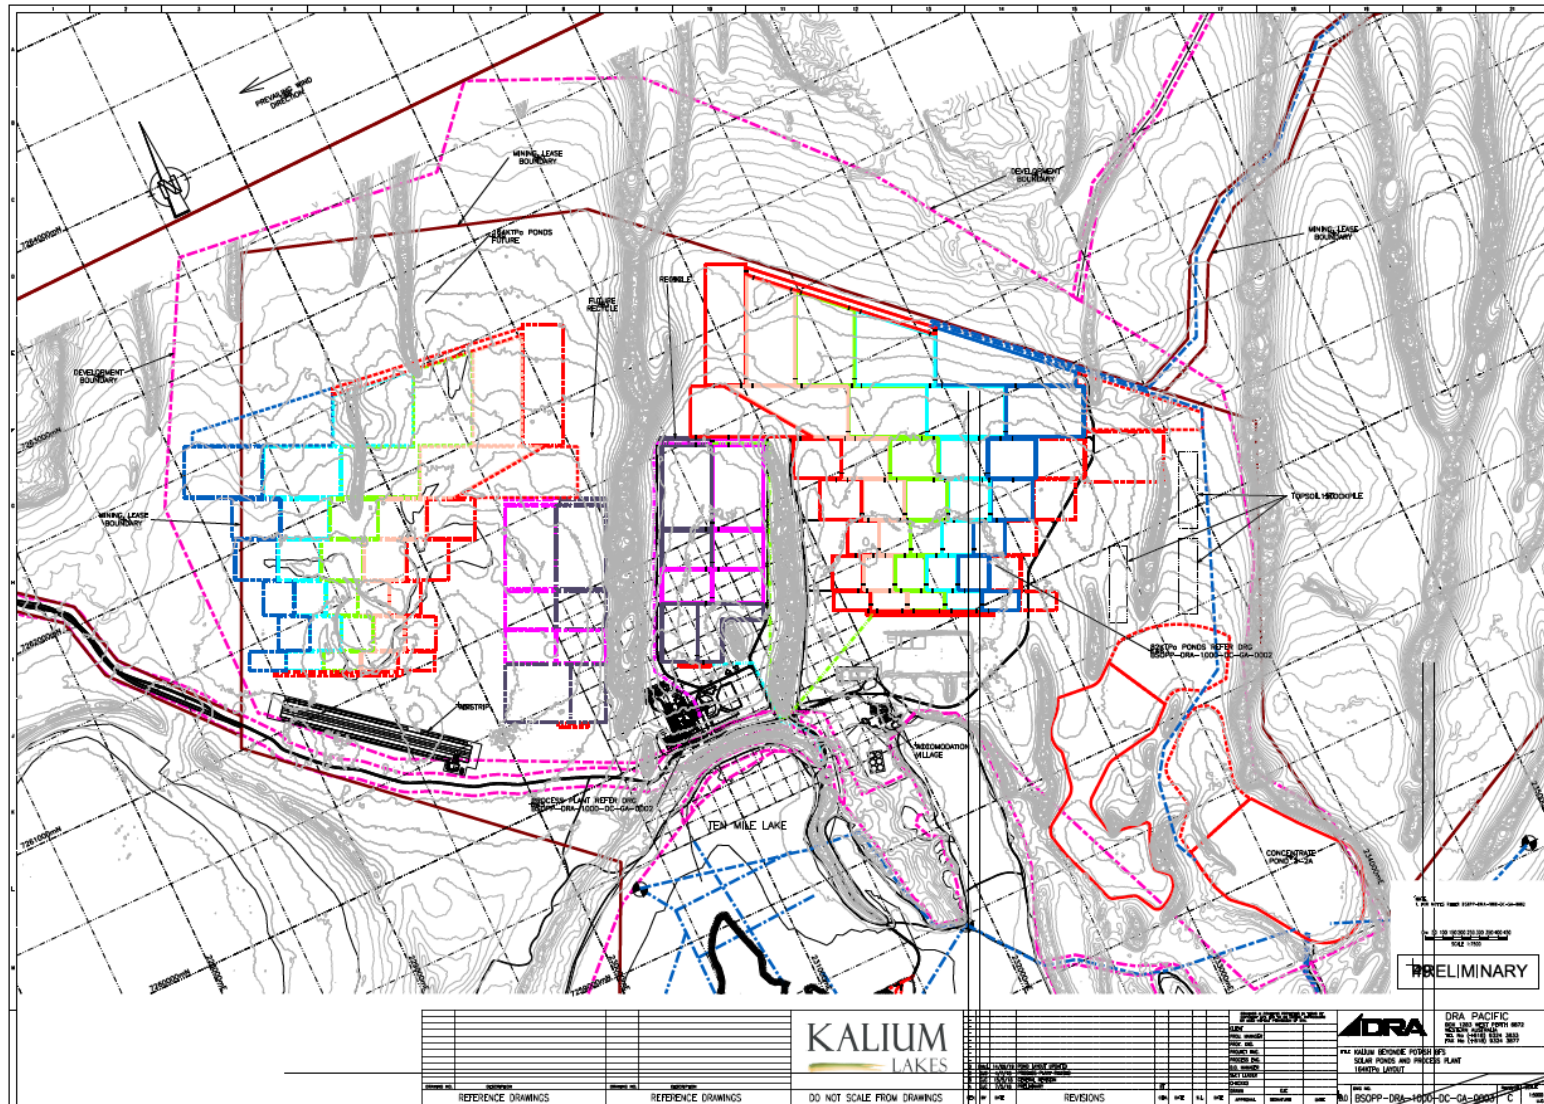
164 ktpa SOP Pond and Plant Layout [16]
